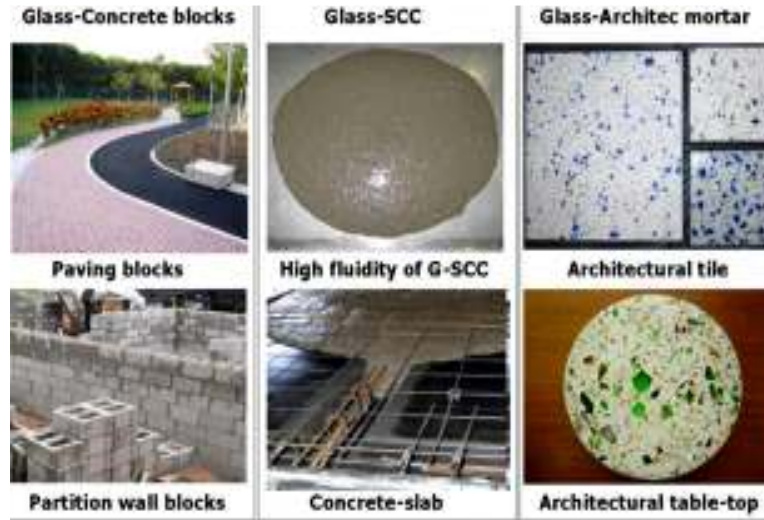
Current and potential application of developed glass-concrete products in construction industries, Ling *et al.* (2013)
